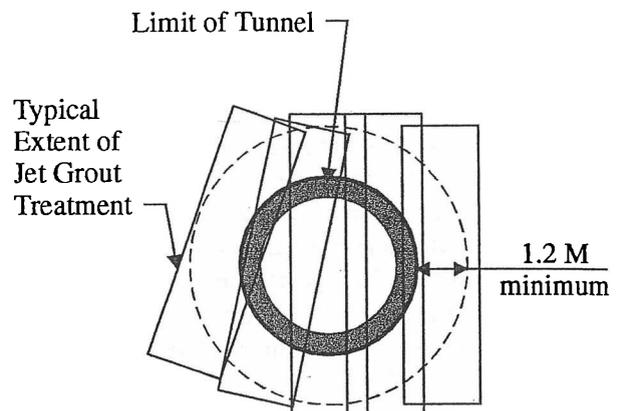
Cross Sectional View of Tunnel With Jet Grouting Shown
